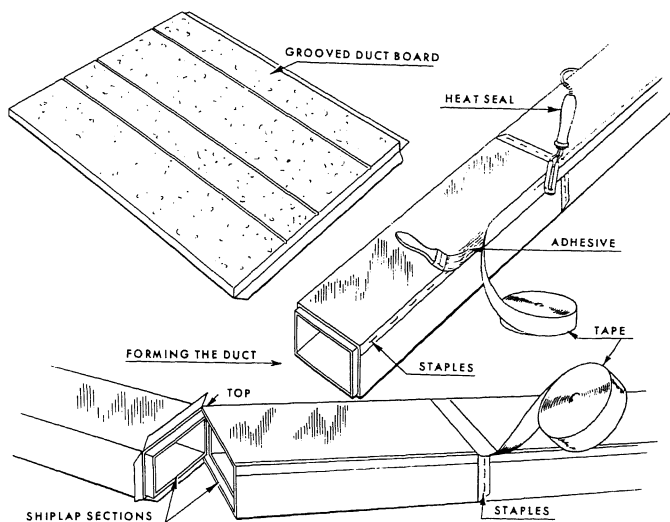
Forming rectangular fiber glass ducts from duct board.
